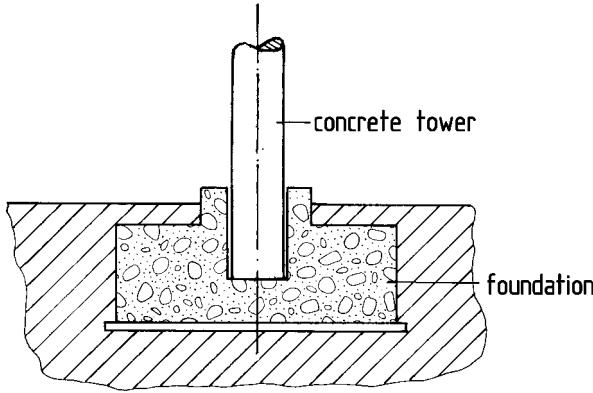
Slab foundation with cast-in prefabricated concrete tower
